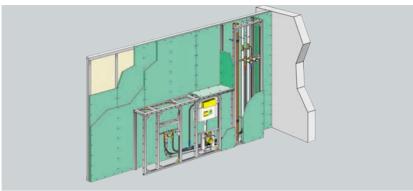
174 Pre-wall installation in lightweight construction wall
